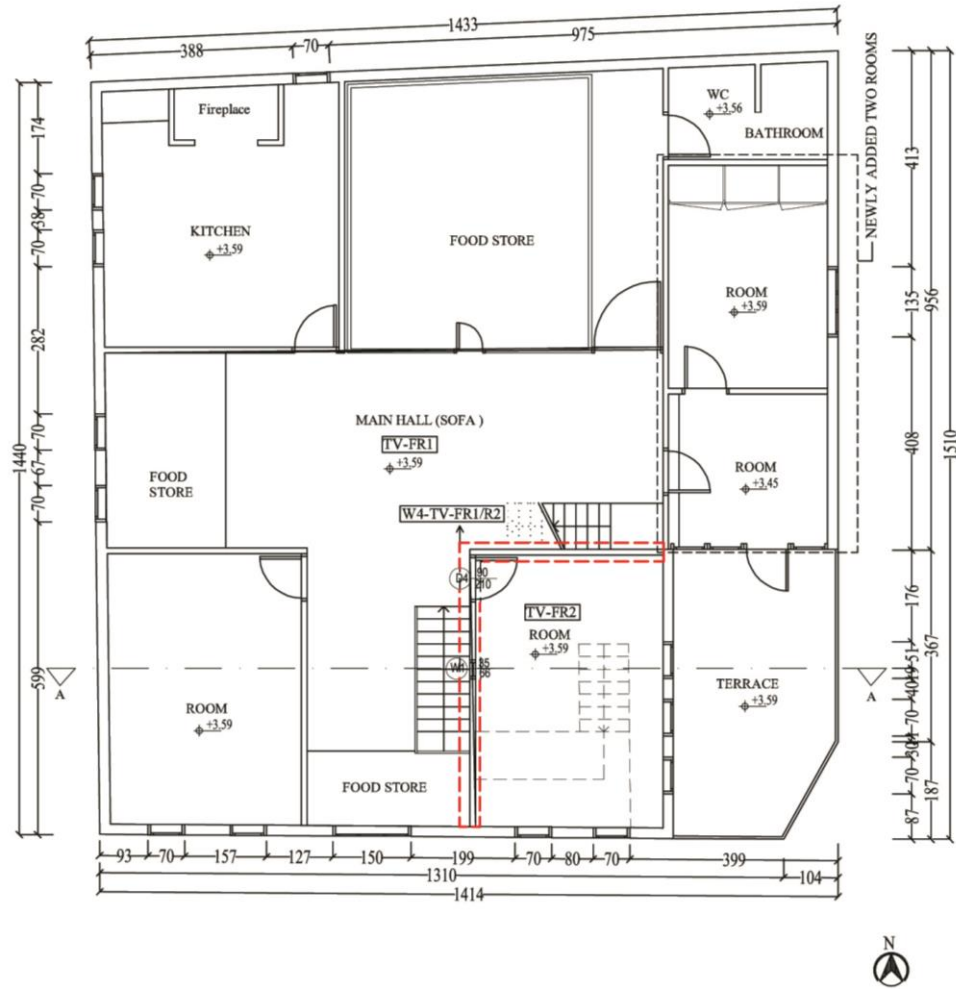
First floor plan of Tahtacıörencik Village House in 1/100 scale (Drawn by author).
